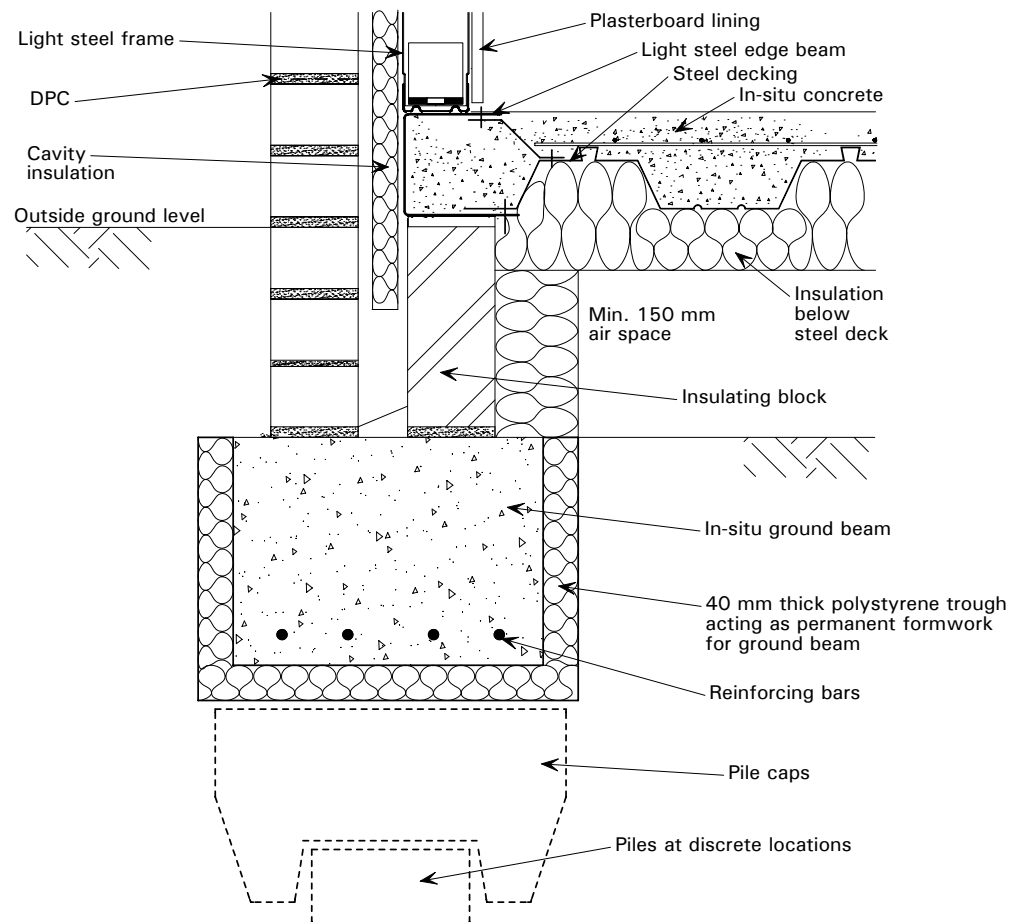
Piled composite ground-floor system with in-situ ground beams formed within polystyrene trough
